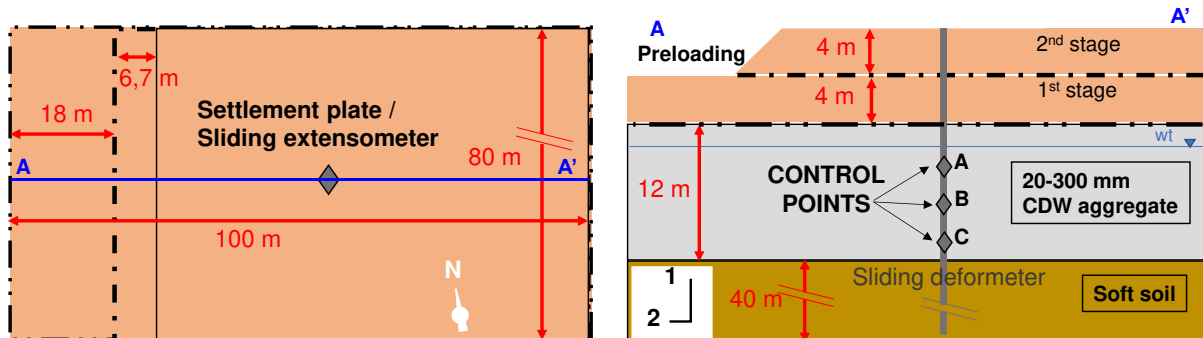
Instrumentation plan: plan view (left) and cross-section (right).
